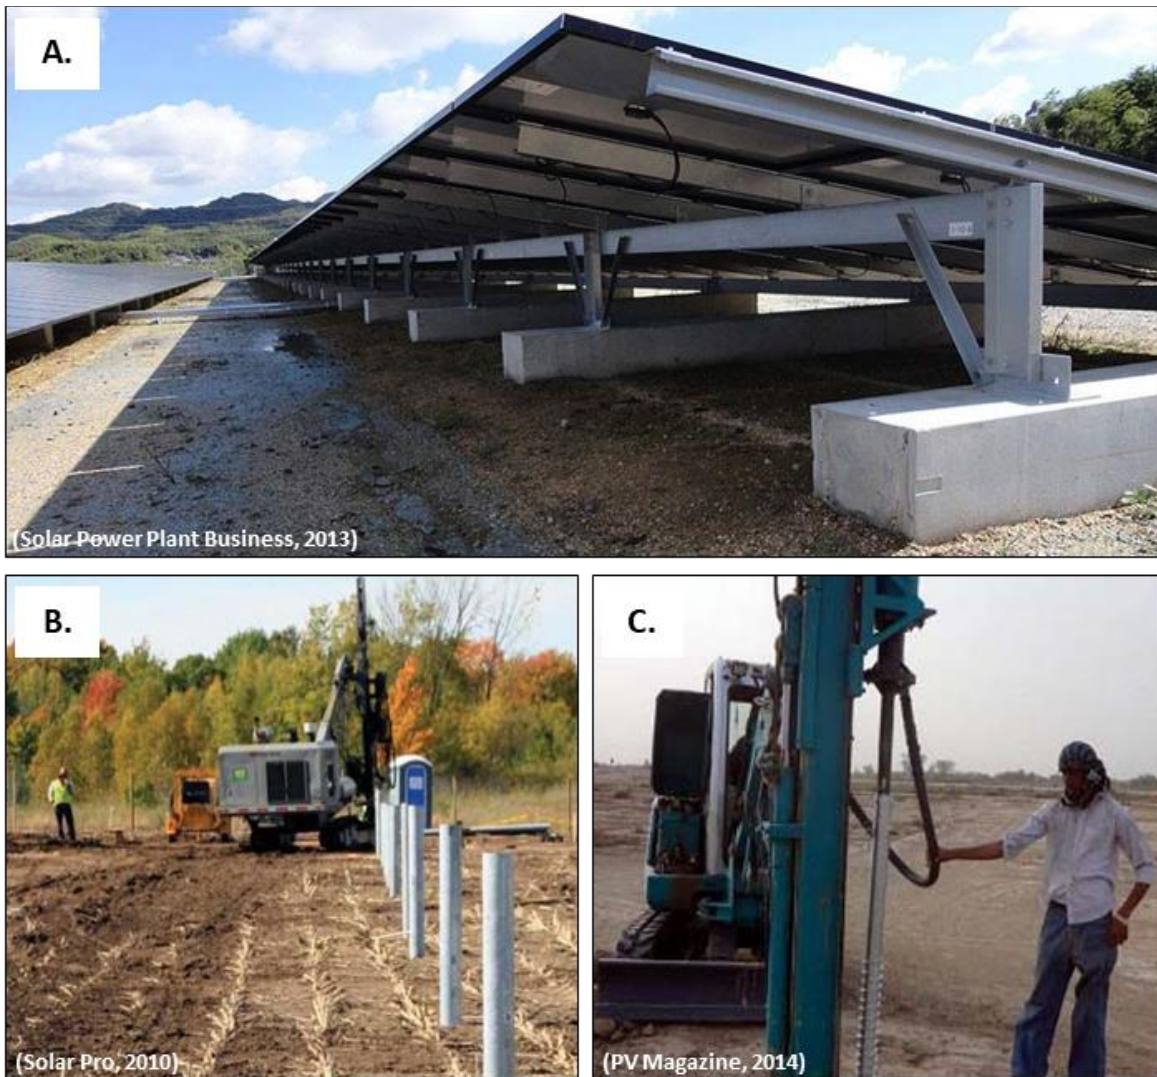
Mounting Structures. A) Cast Concrete Foundation. B) Driven/ Rammed Steel Pile. C) Ground / Earth Screw.
